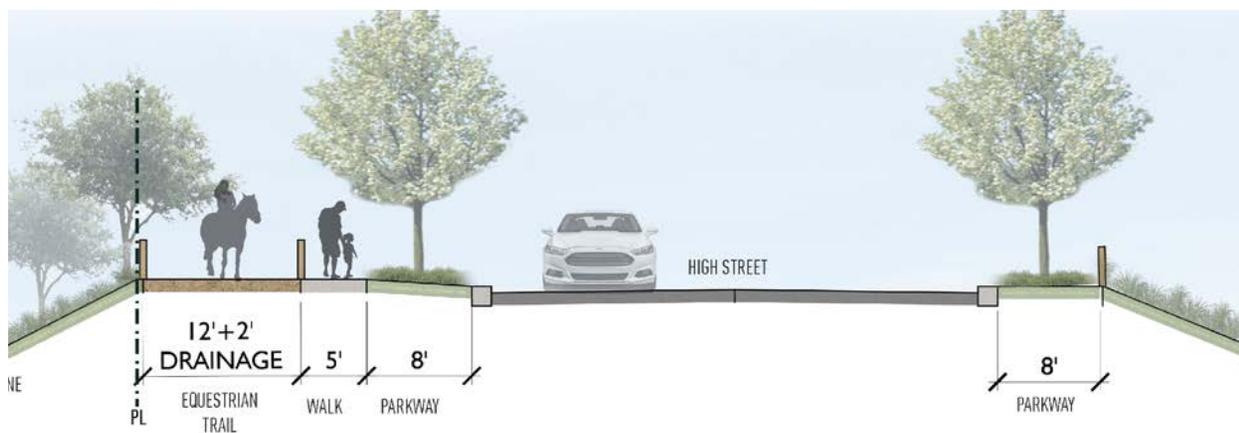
Street Section- Local Collector Street Casey Road (on-site)
